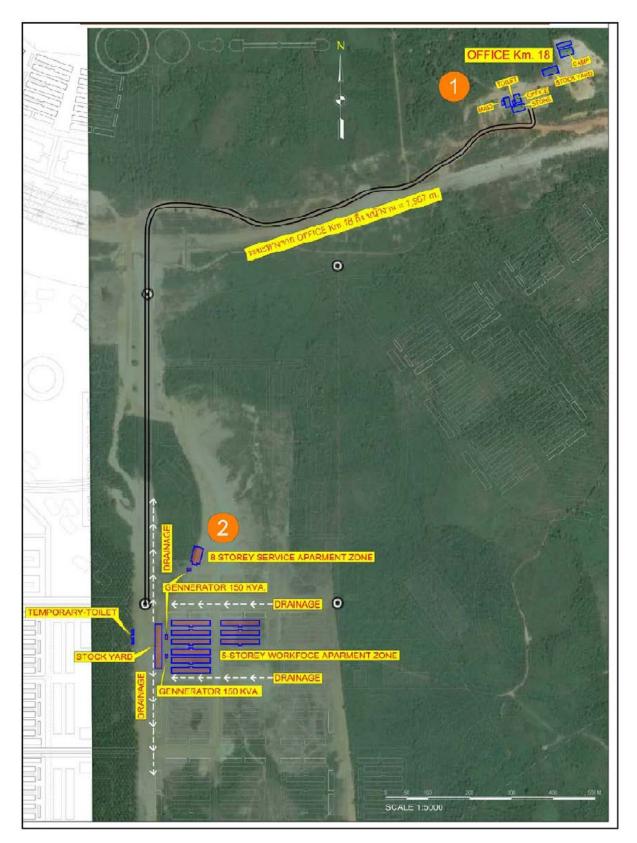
Layout of Main Construction Camp, Workshop and Yards
